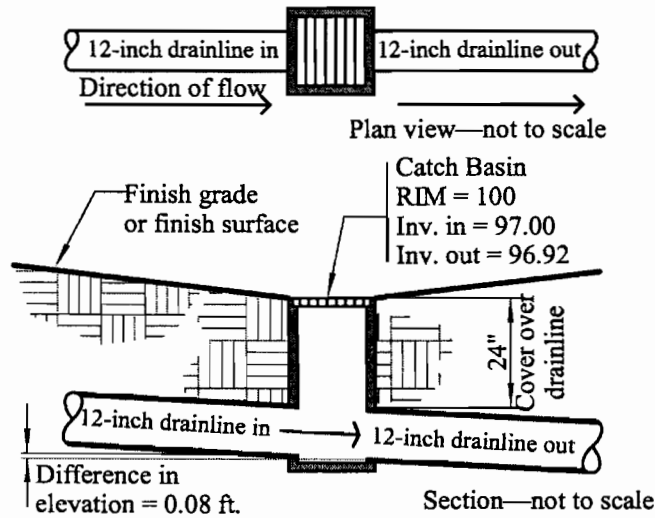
Condition 1—Setting Invert Elevation for Same Size Pipe In and Pipe Out
